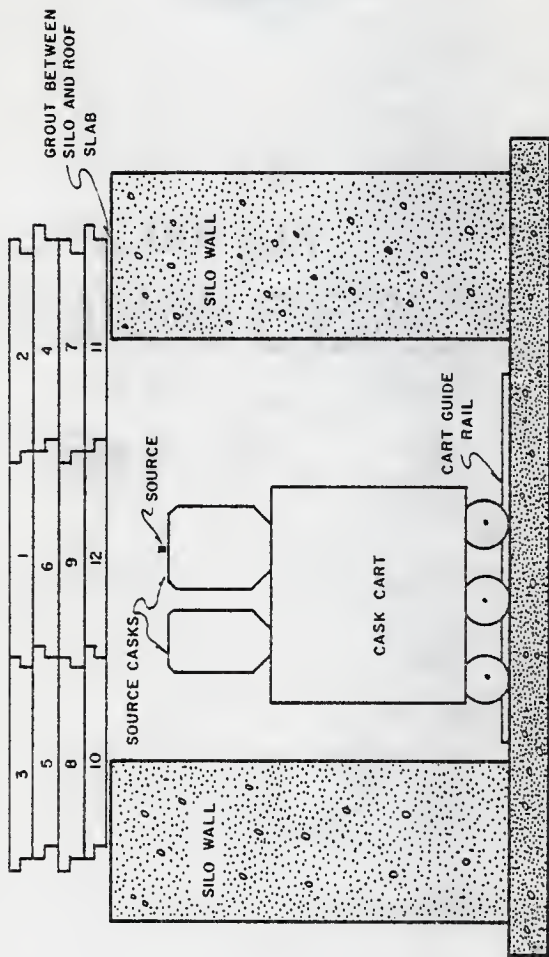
Vertical section of source silo showing roof shield stacking pattern.
